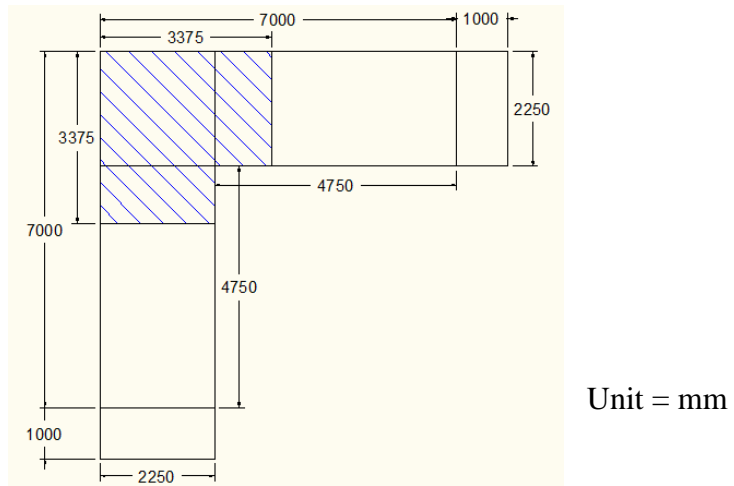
The layout of 90° walkway with width of 2.25 metres
